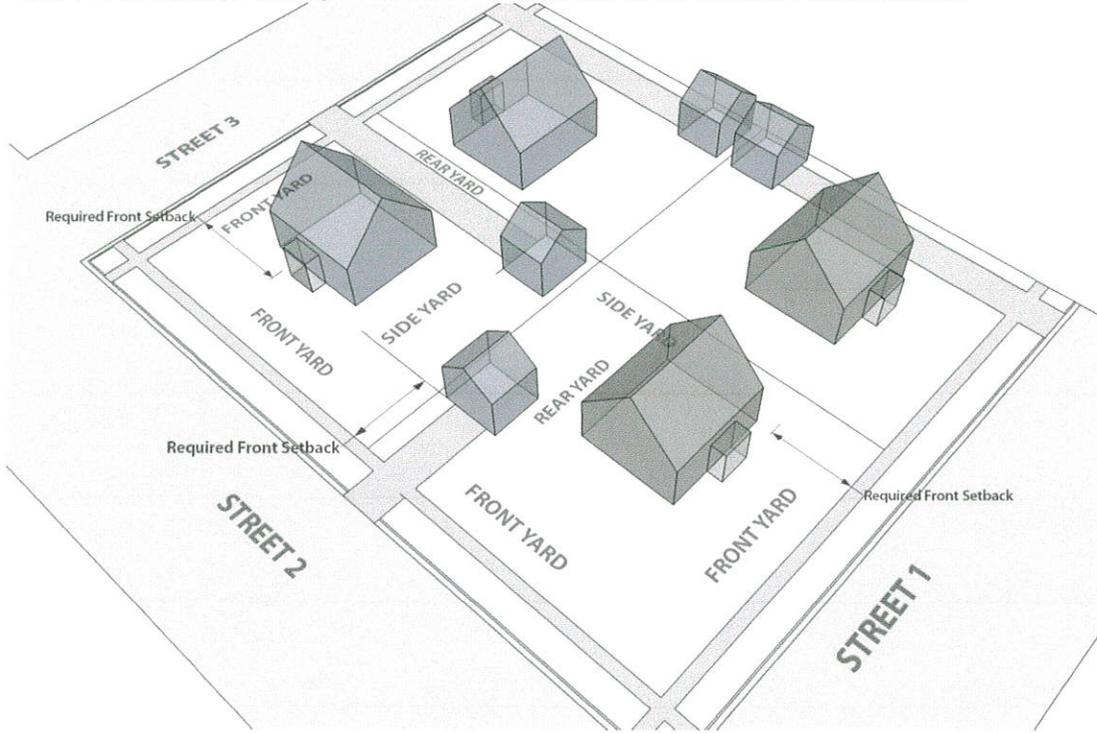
Accessory Building Location for Corner Lots with Side-Side Yard Situations
